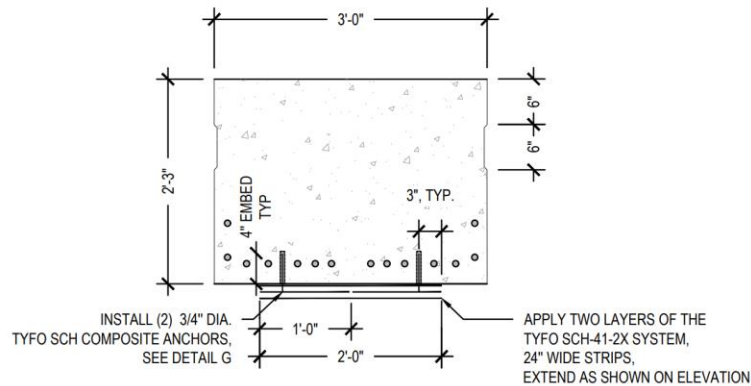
Beam 2 retrofit detailing (cont'd)
